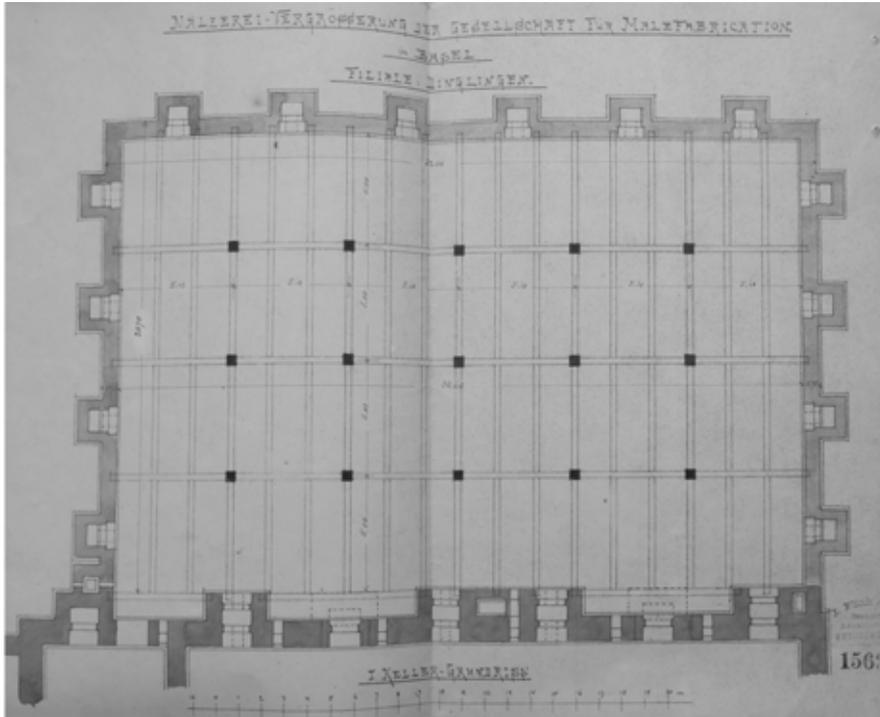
Ground floor plan, with the 15 columns highlighted as part of the application of building permission, 1895. Photo: Kuban. Lahr Building Authority Archive.
